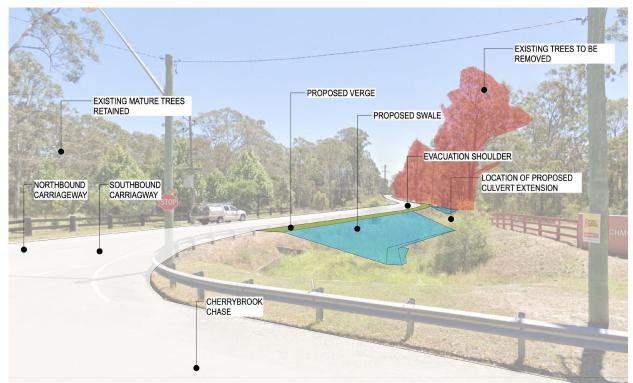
Viewpoint 7 - Intersection of Londonderry Road and Cherrybrook Chase (facing north) - Proposal view
